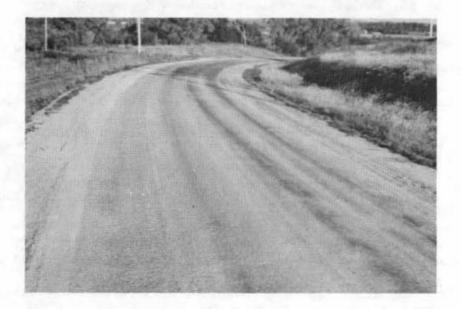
Extra chips spread to prevent further stripping, fall 1971, Clinton test road.
